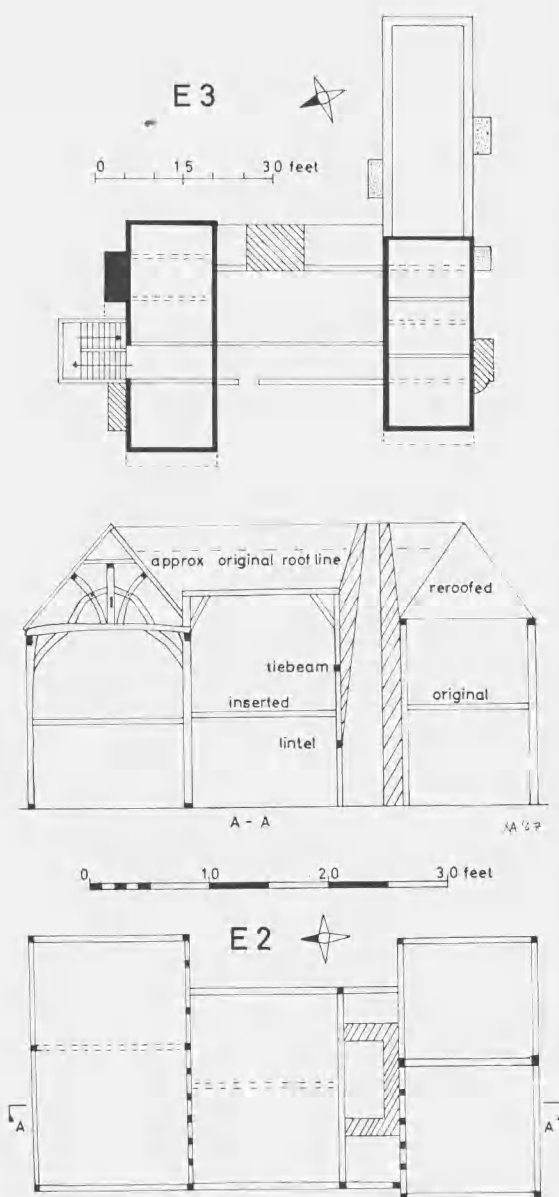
E3. Ford House; shading indicates seventeenth century chimneys, stippling nineteenth century ones. E2. Paynes Plan and Sections: inserted Fireplace indicated by shading.
